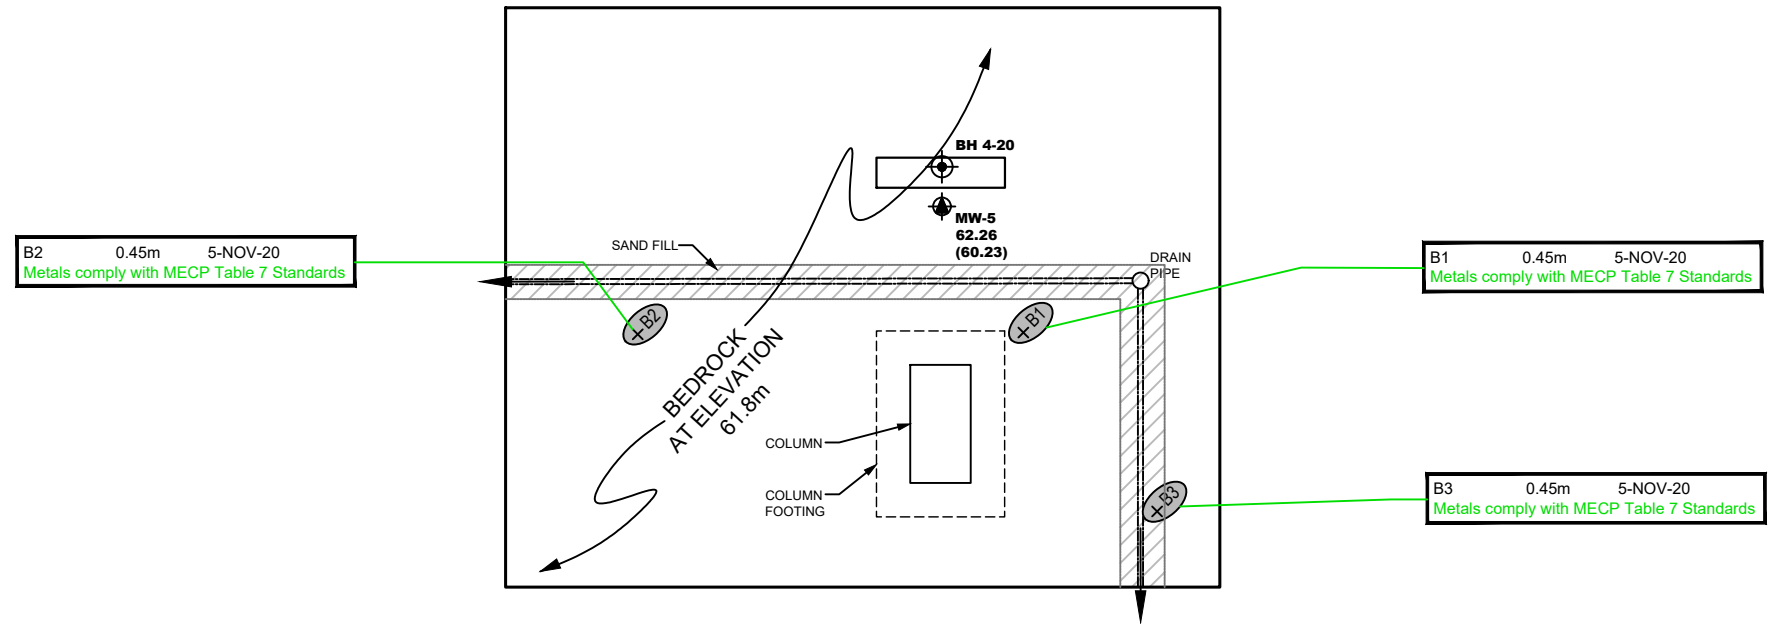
B – Remediation Excavation and Sidewalls –
